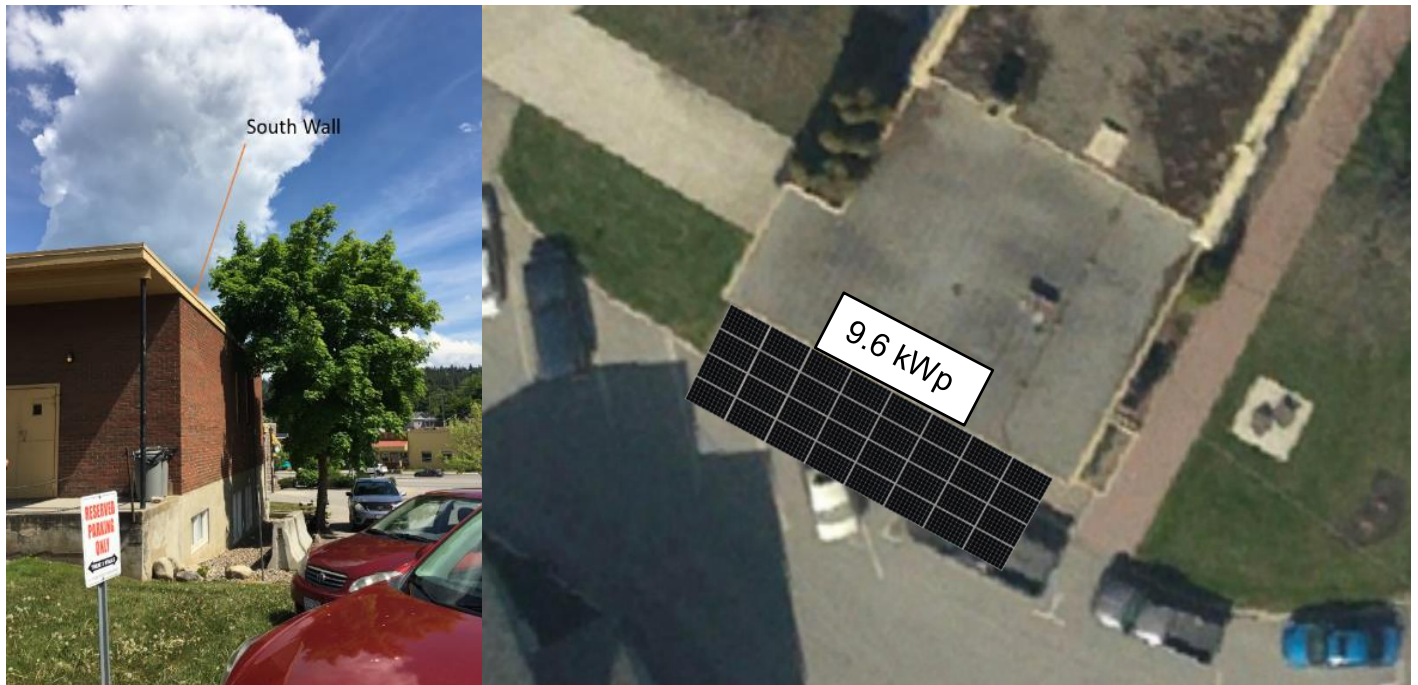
Art Centre South Wall Solar Parking Shelter Concept
